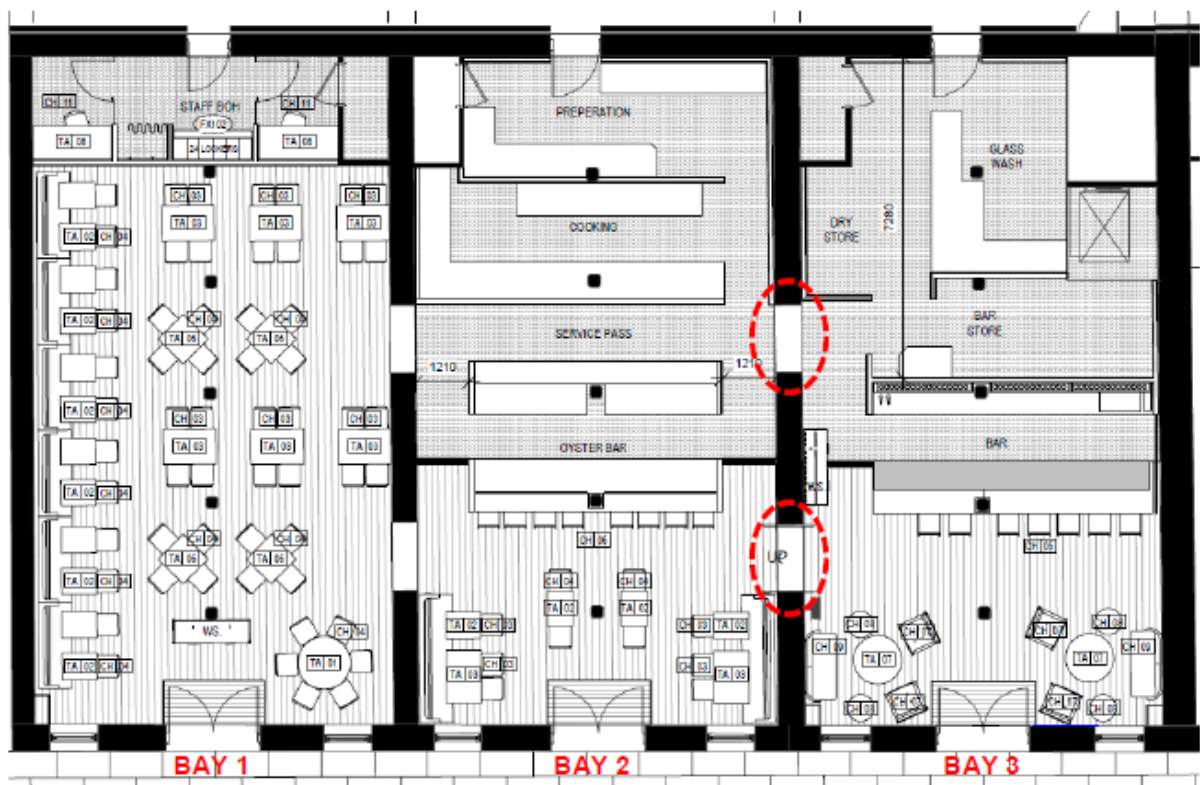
| Proposed fit-out with proposed doorway openings shown in red (Source: EIS)
